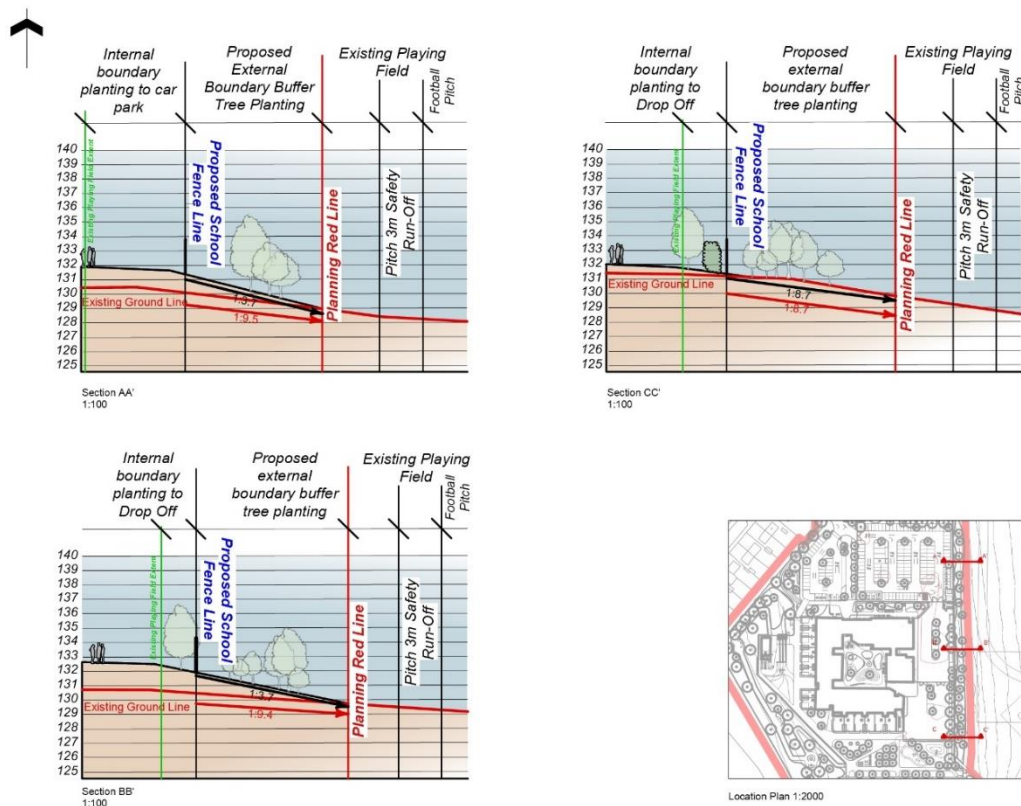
Sections through proposed school eastern boundary to existing playing field and pitches.
